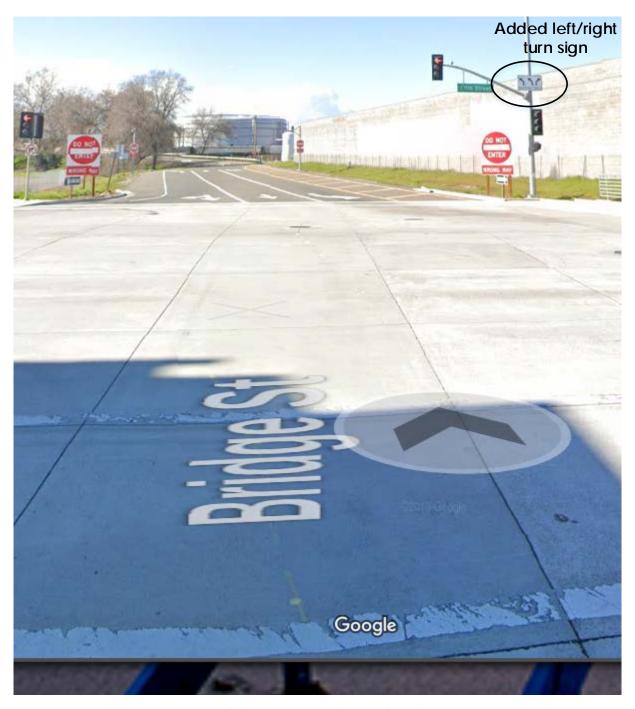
Caltrans' sign addition for westbound Bridge Street on the southwest side of the intersection at the South River Road exit ramp. Image courtesy of Google Street View.
